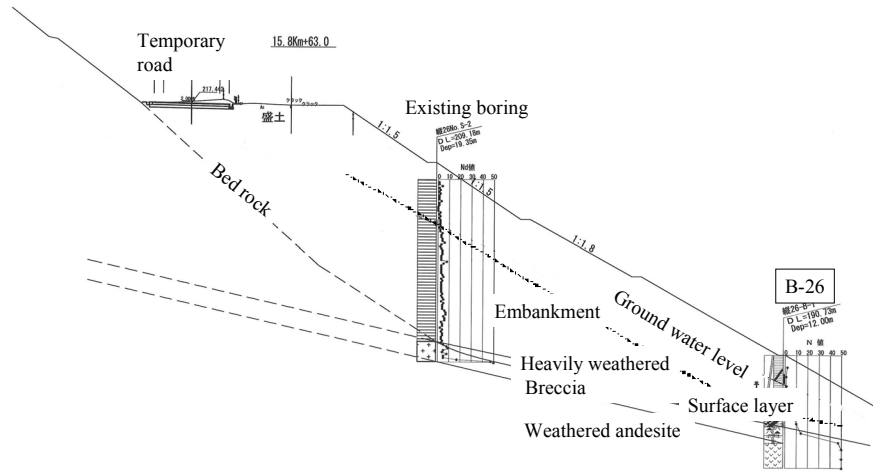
(a) to (c) show the soil profiles, and Figures 5 (a) to (c) show cross-sections of each boring site. Each of these boring was conducted near the toe of the embankments (B-26, B-22 and B-36 in figures 5). Boring at Site 38 (Failure) was conducted in the undisturbed area of the same embankment. These borings revealed that the N values within the embankments were lower than 5, irrespective of the damage degree in each boring site, but the water level within the embankment was low both in undamaged and settlement/crack sites, and high in failure site.
